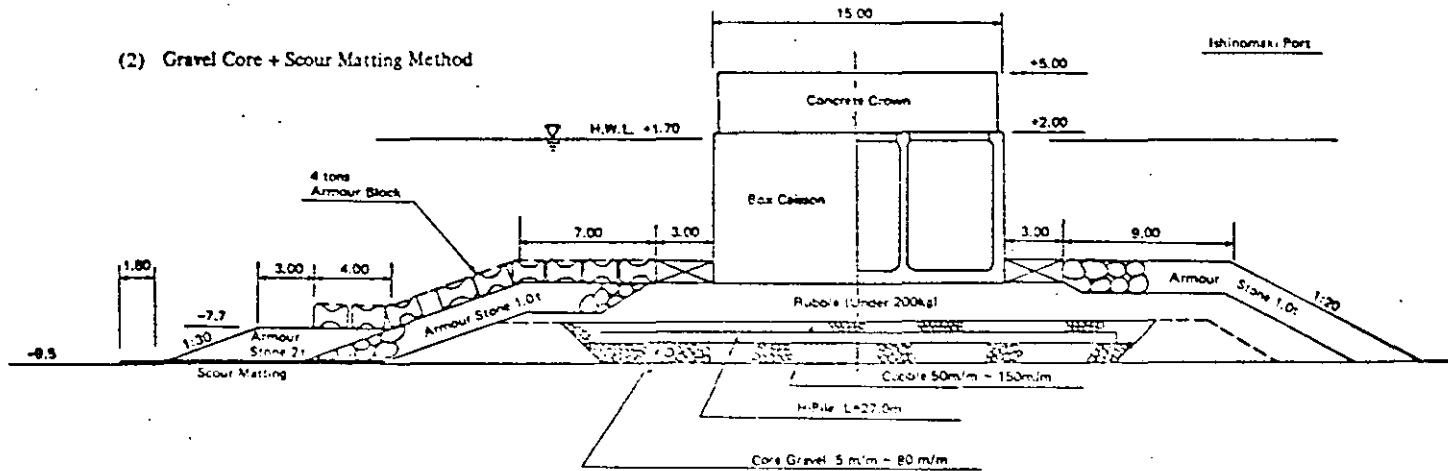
Protection Method for Inside Scouring of Composite Type Breakwater
